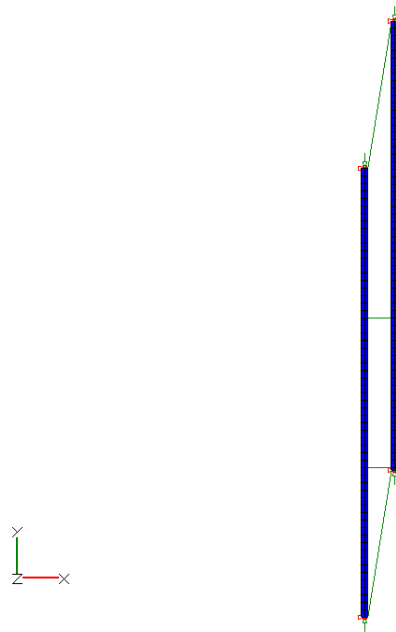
Twin girder system – Staggered cross-frame arrangement – 78.5-degree skew – initial geometry
